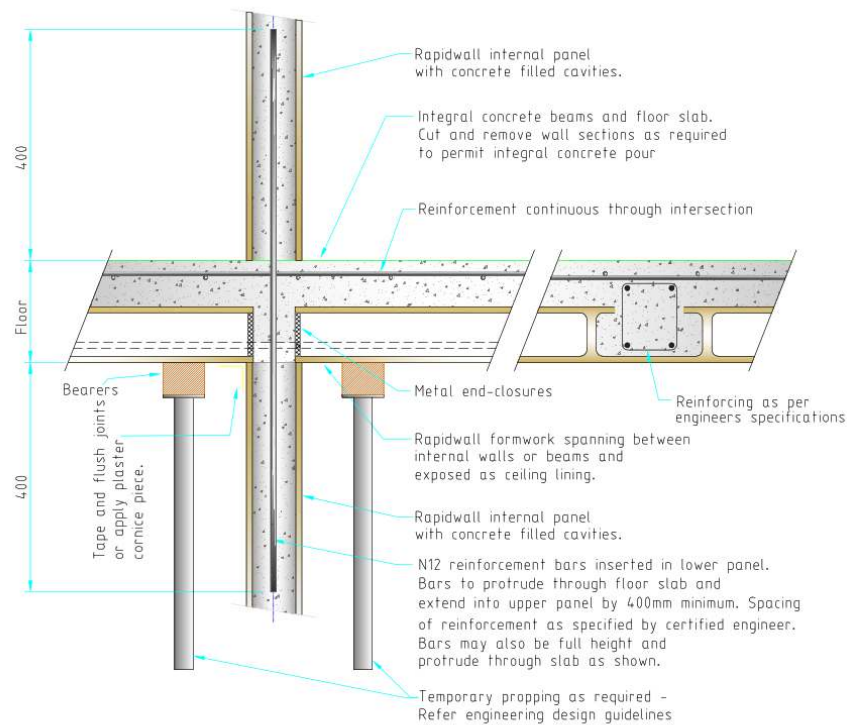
Concrete filled Rapidwall with Rapidwall slab formwork / ceiling internal wall to suspended slab
